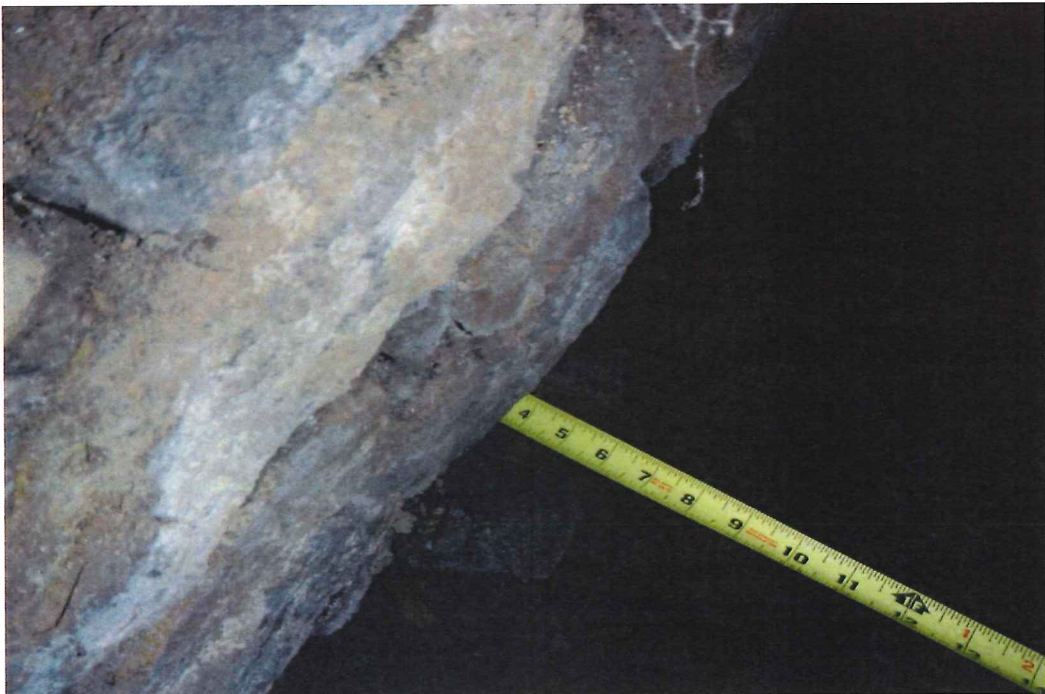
Looking downwards at a section of stone that had deteriorated along the foundation wall
